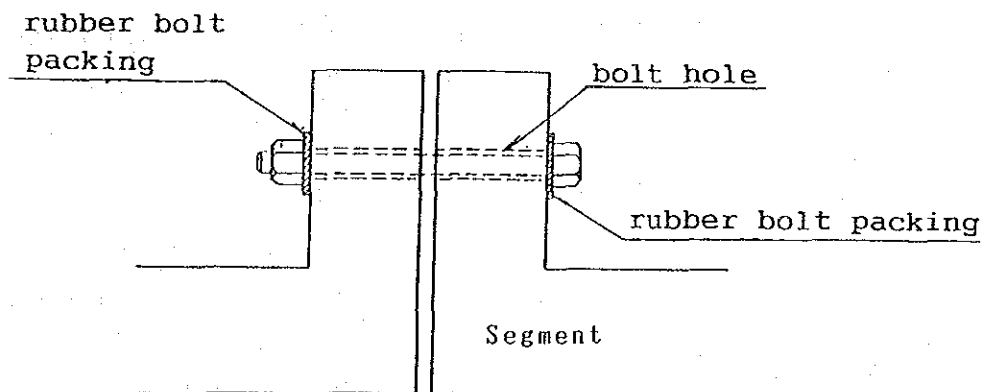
Stopping Leaking Water at Segment Bolt Connecting Holes
